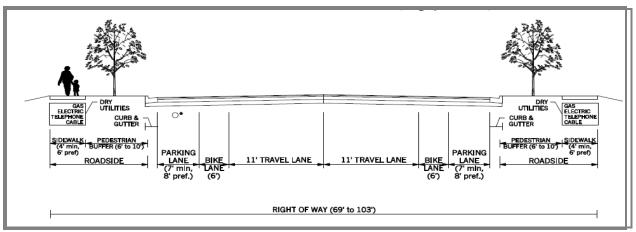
Thoroughfare Plan Cross Section: Collector Suburban
